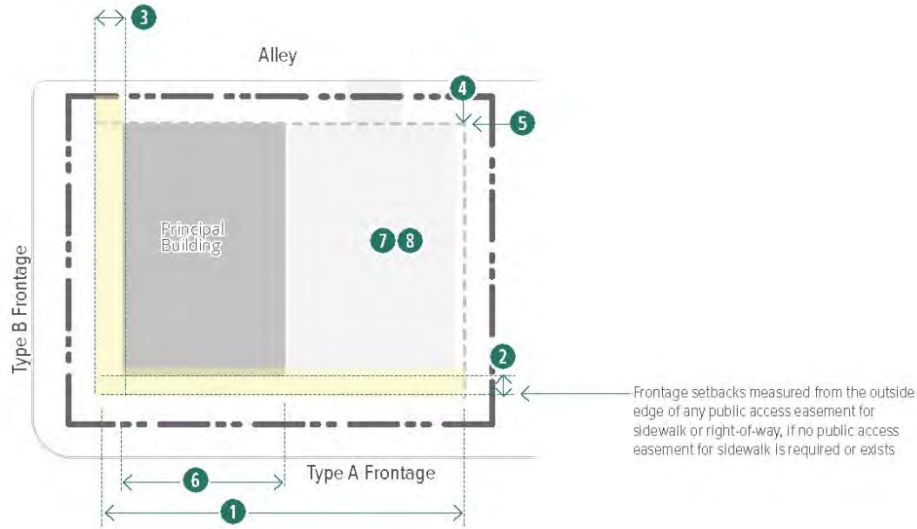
Commercial Storefront Building Plan: Building Siting Requirements
